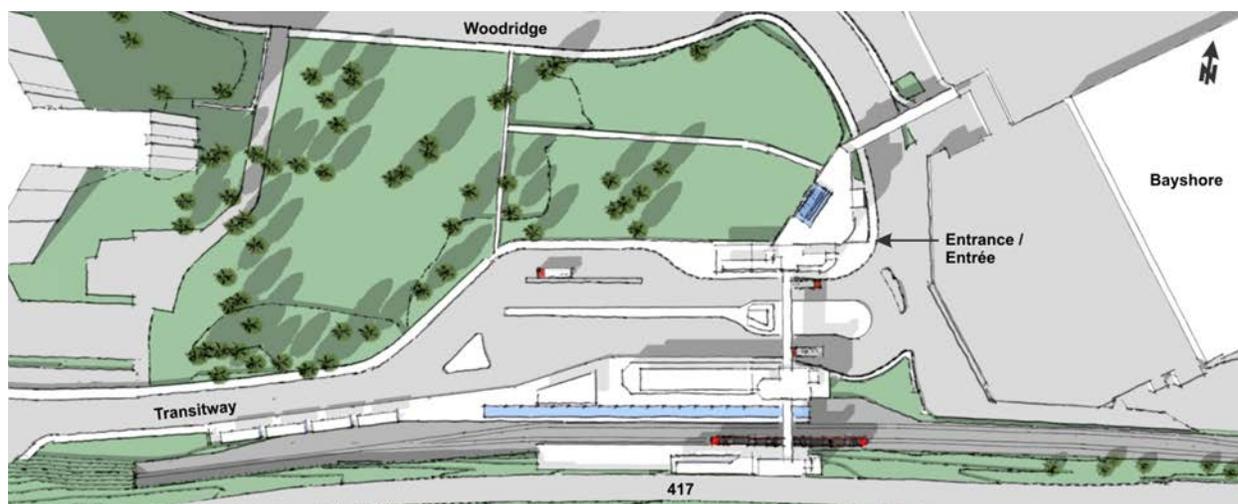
Plan View of Bayshore Station Showing LRT and Bus Platforms and Reuse Of Existing Structures
